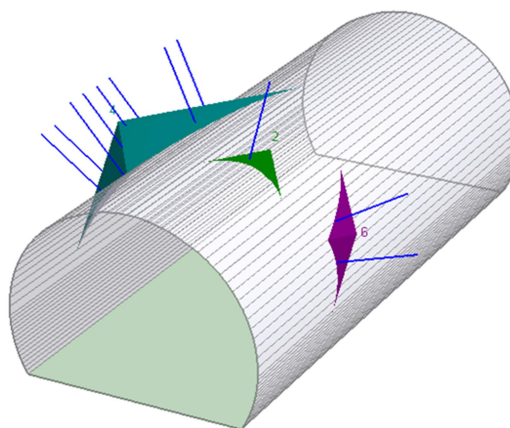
b. Modeling between 3+210 to 3+230 with protections
